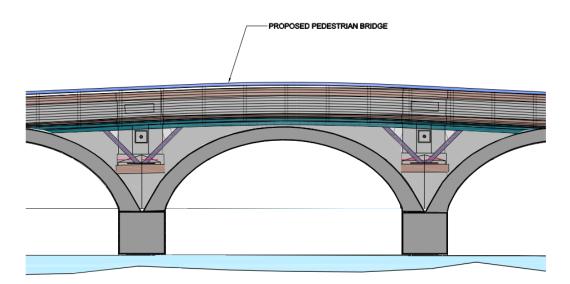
Typical Structural Elevation for a span of the masonry arch bridge
